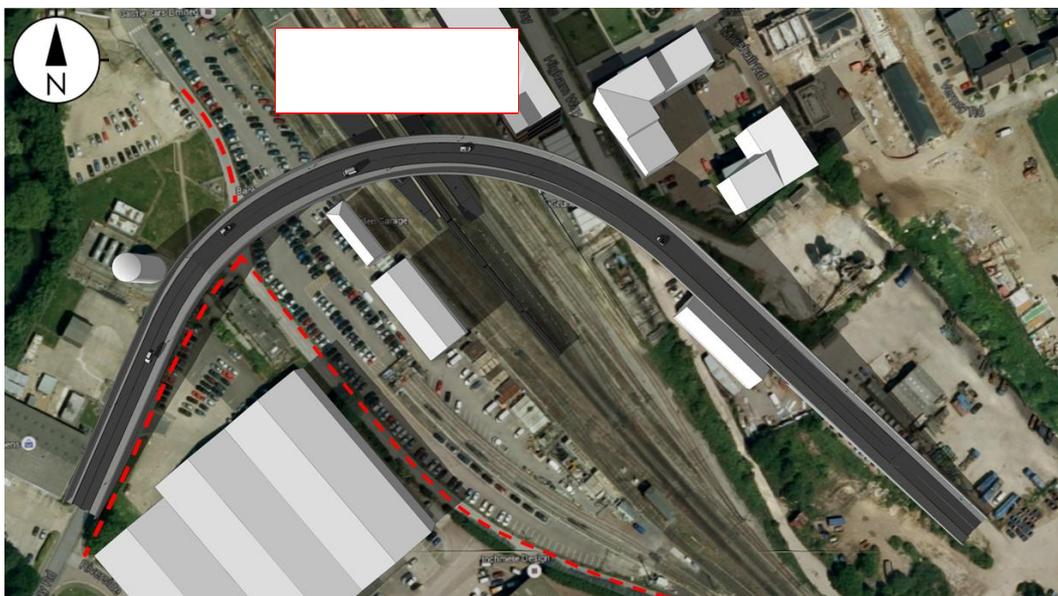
Re-aligned link road between Tramway Road, Station Approach and non-public highway to the industrial estate.
